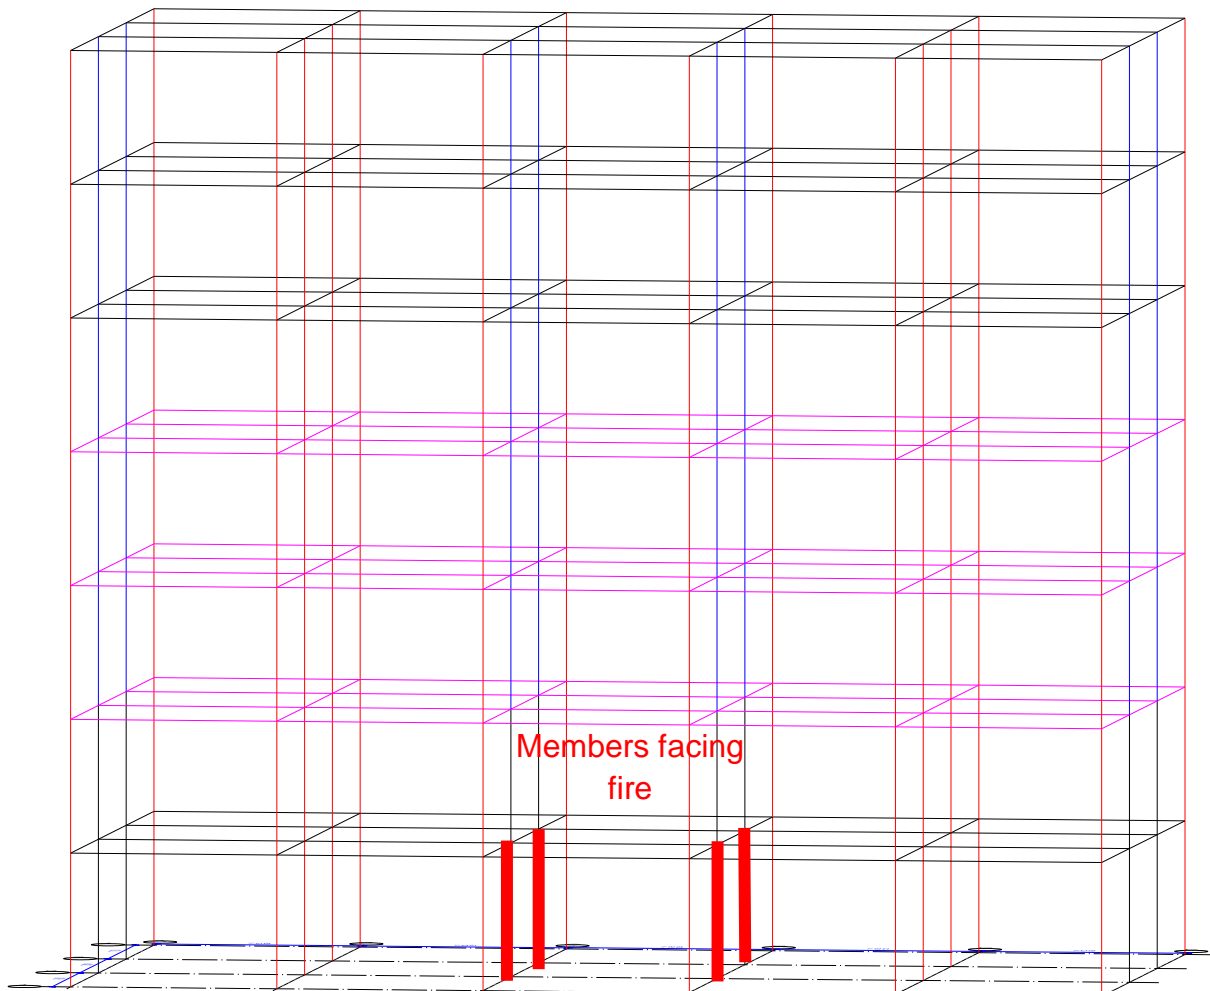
3D view of the static model—the marked columns are on four sides exposed to fire. Cross-section dimensions and material properties are given in Table 6.1
